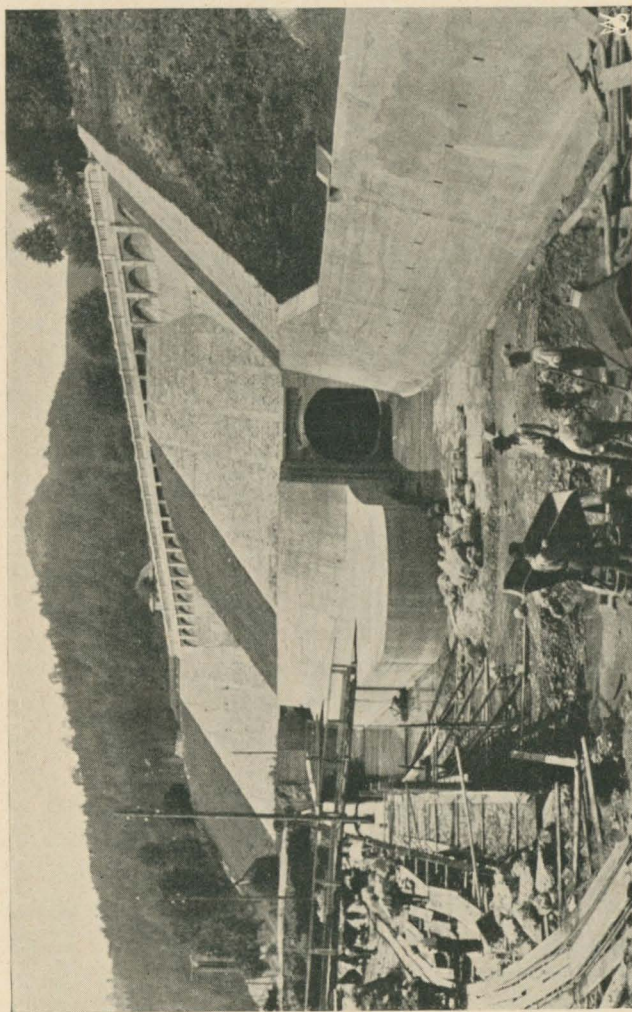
Hydro-electric plant „Porabka“. Outlet canals of the tunnel (under construction).
